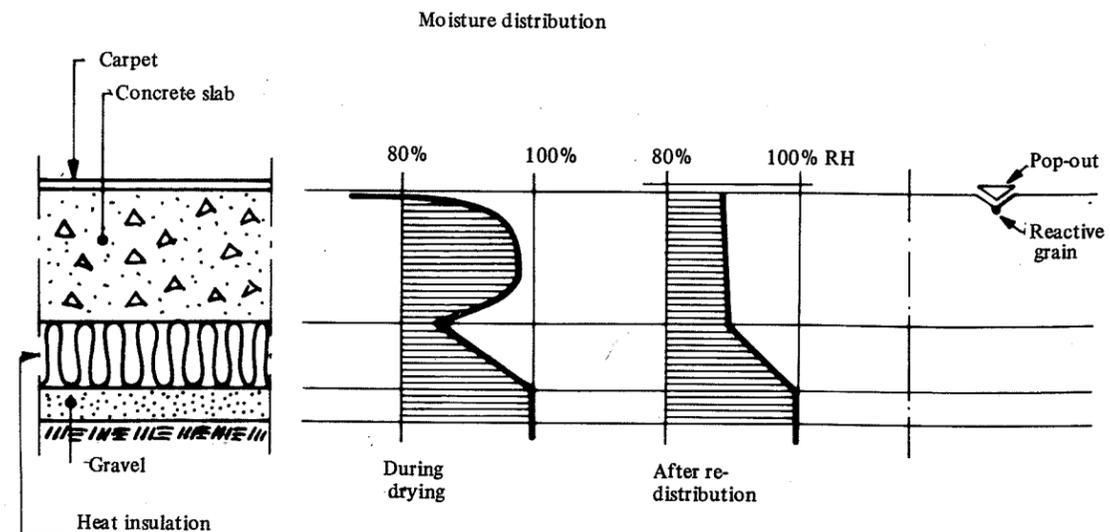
Typical floor structure and moisture distribution of a concrete slab laid directly in the ground
